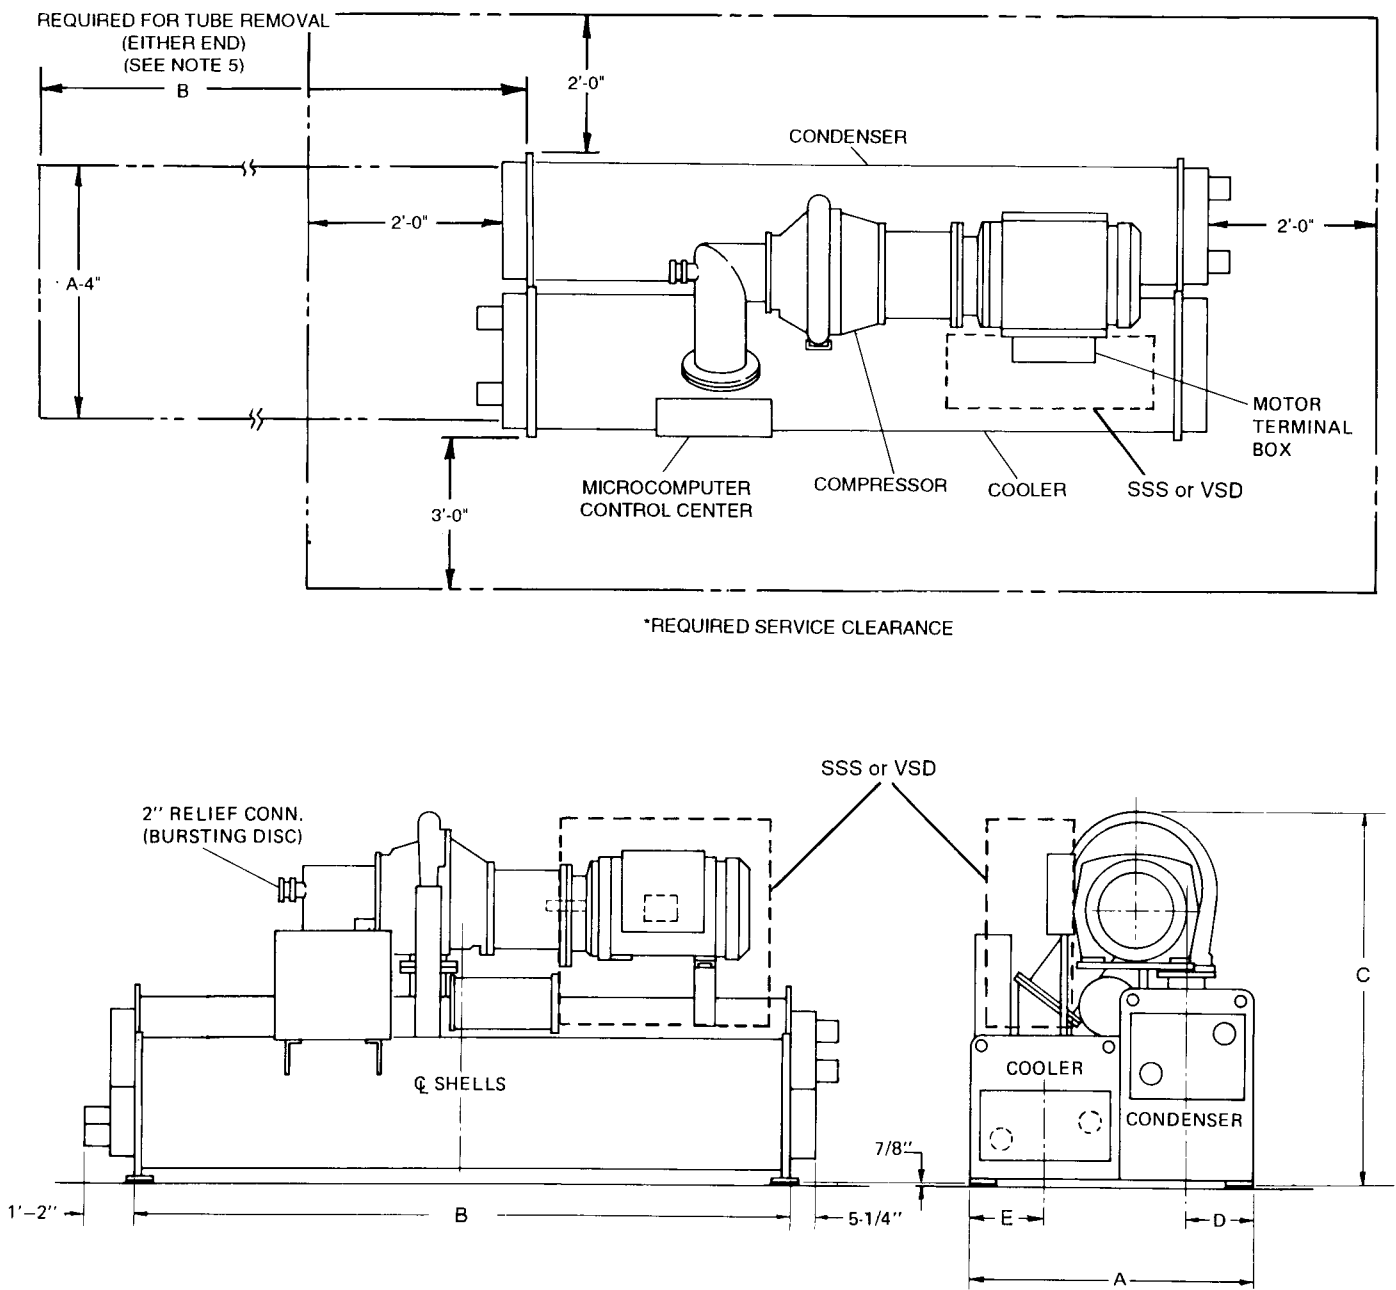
OVERALL DIMENSIONS AND SERVICE CLEARANCES
